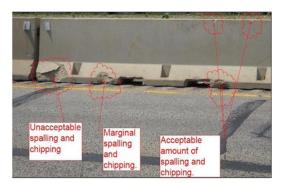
Spalling and Chipping—WisDOT (43).
